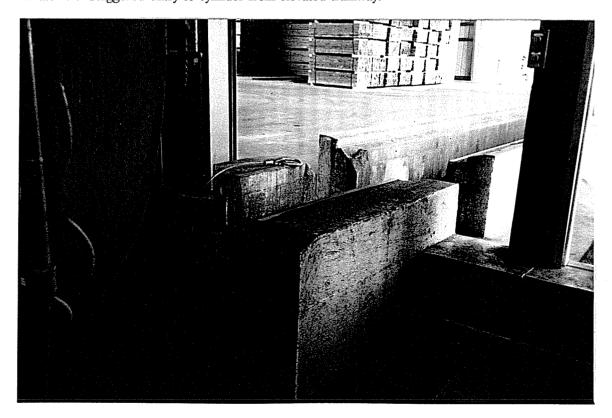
Staggered entry to cylinder from elevated tramway.
